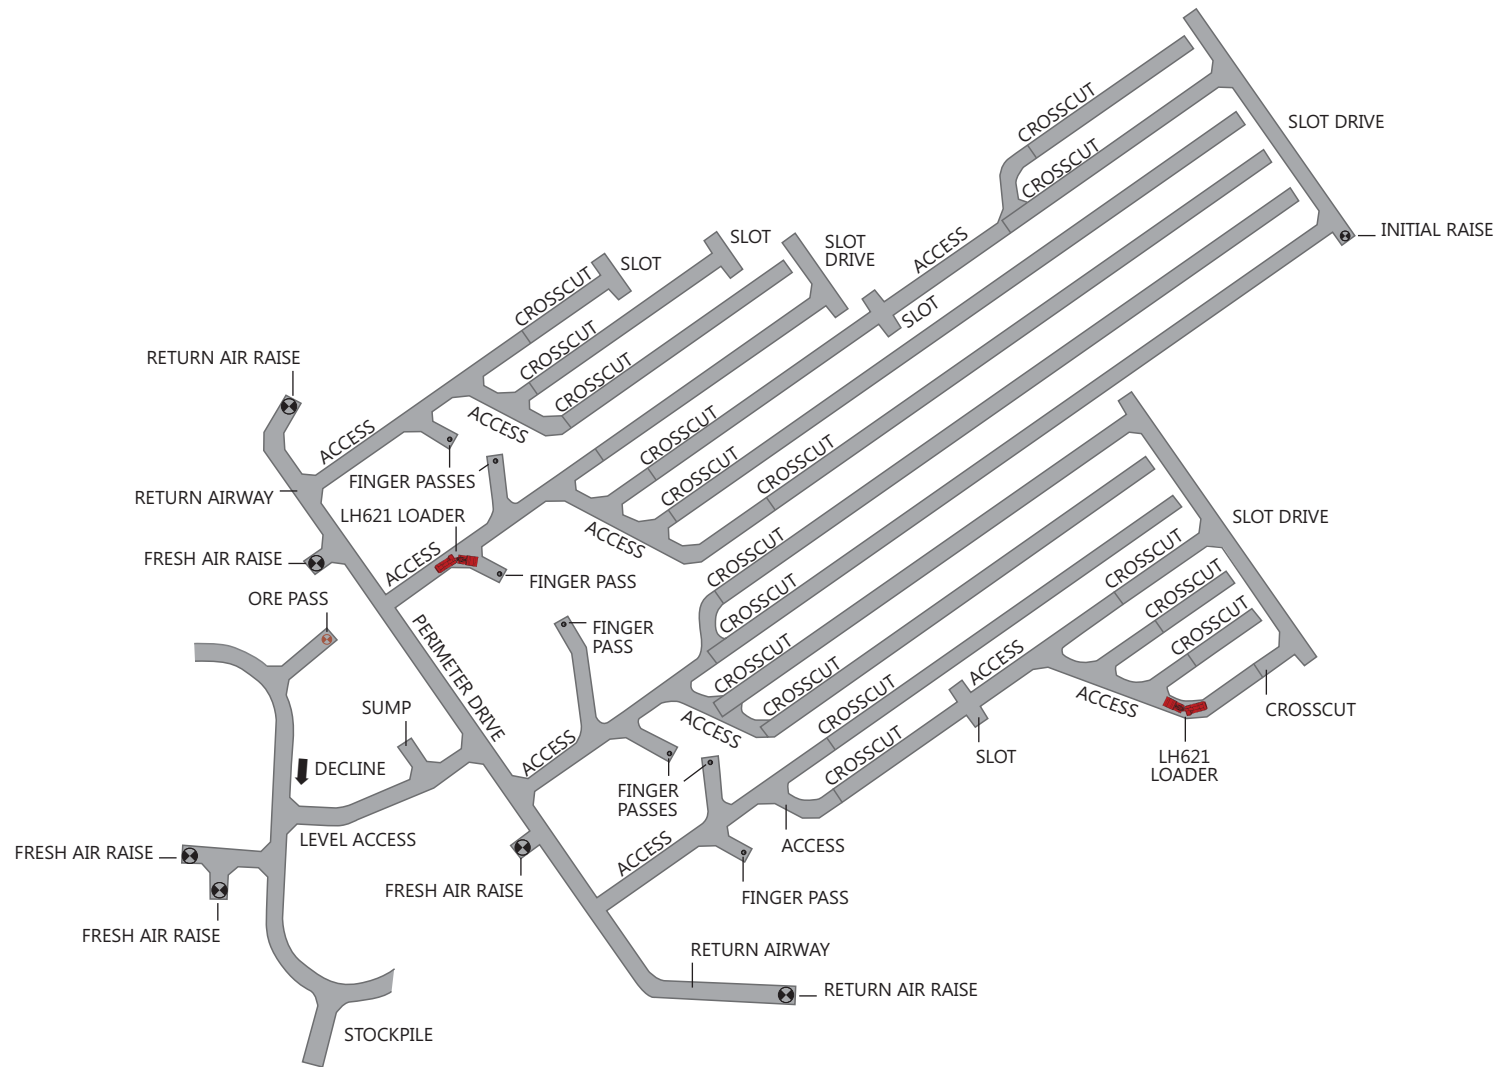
Indicative Sub-Level Cave Mine Level Layout
